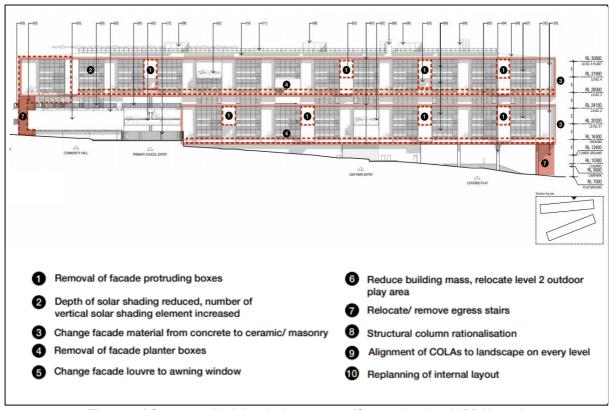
| Summary of building design revisions (Source: Applicant's RRAI 2020)
